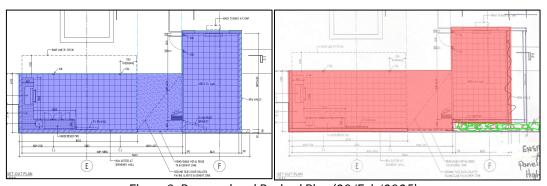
Proposed and Revised Plan (20/Feb/2025)
